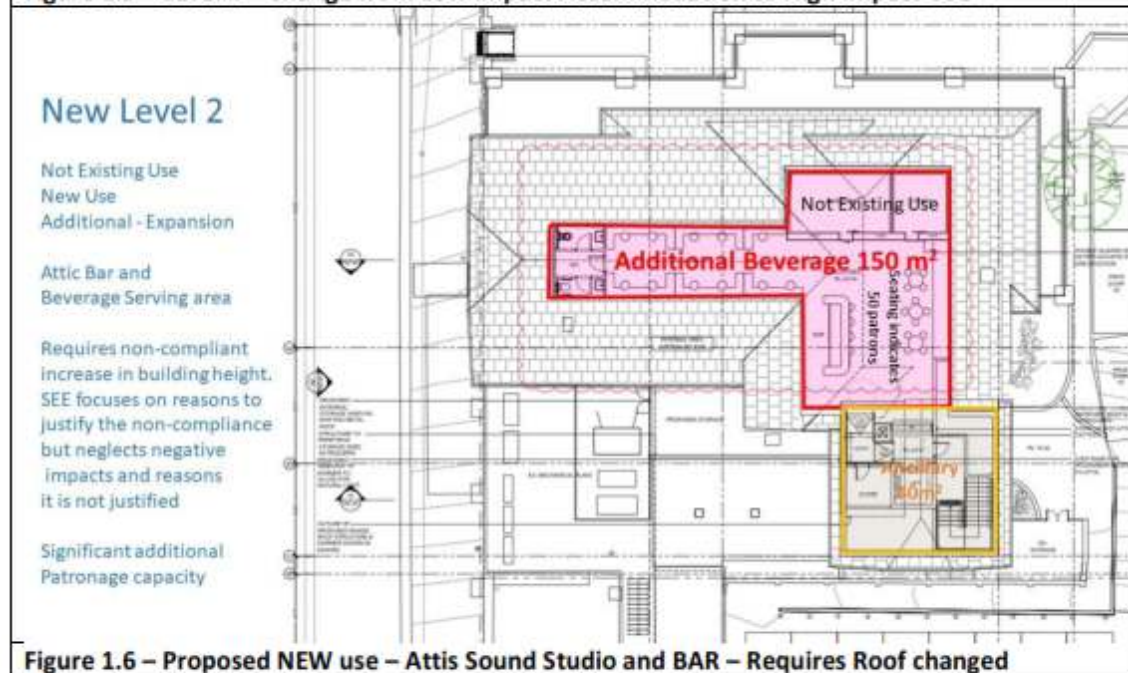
Proposed NEW use – Attis Sound Studio and BAR – Requires Roof changed
